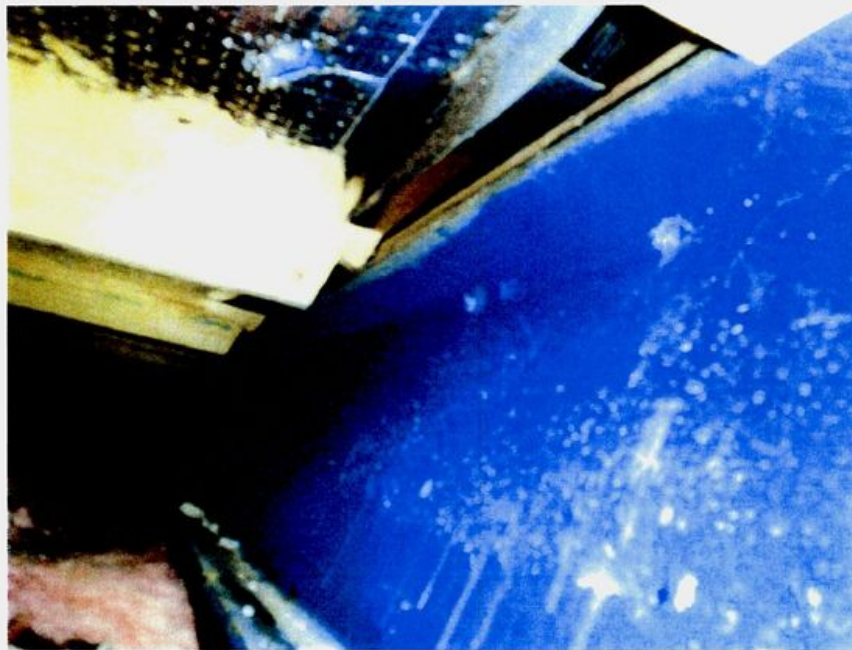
Part east wall beam with wall plate supported on eastern side of top flange. Note no connection of wall plate to top flange.
